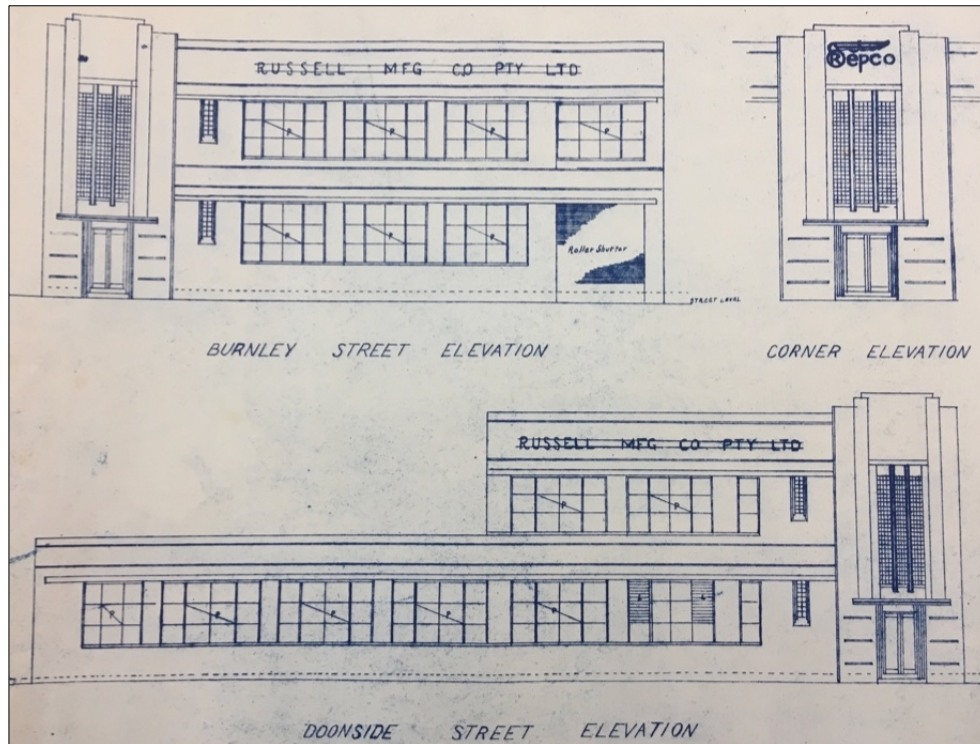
Undated (c1942) architectural drawings for the Recco building on the corner of Burnley and Doonside Streets. Source: Public Record Office Victoria.
